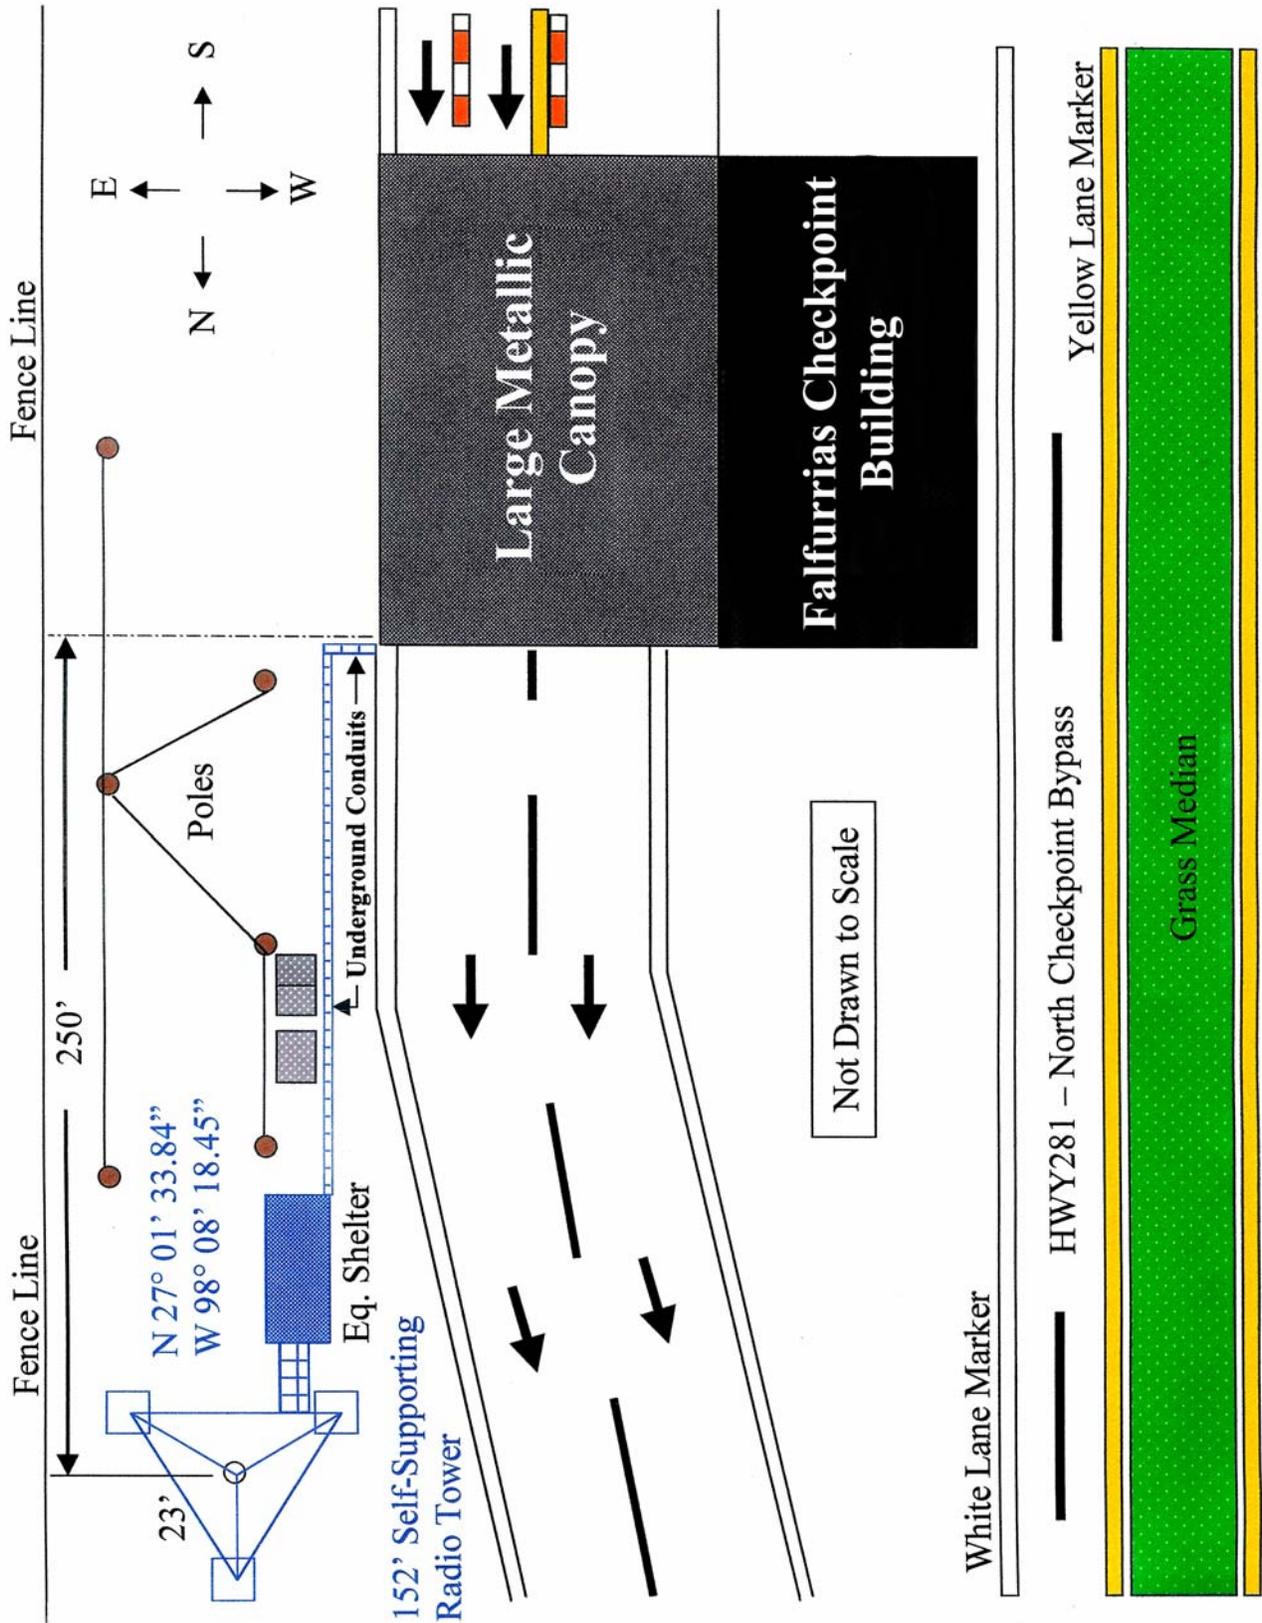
SITE LAYOUT OF FALFURRIAS CHECKPOINT (PROPOSED CONSTRUCTION IN BLUE).
